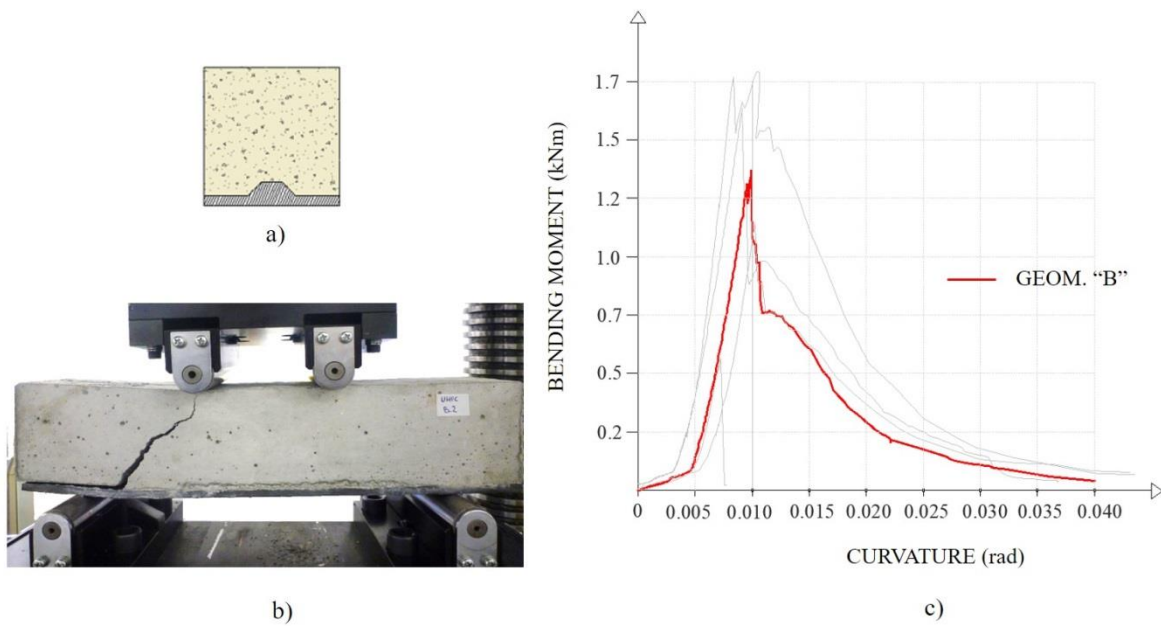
4-Point bending test on specimen “SMOOTH PLATE”:
